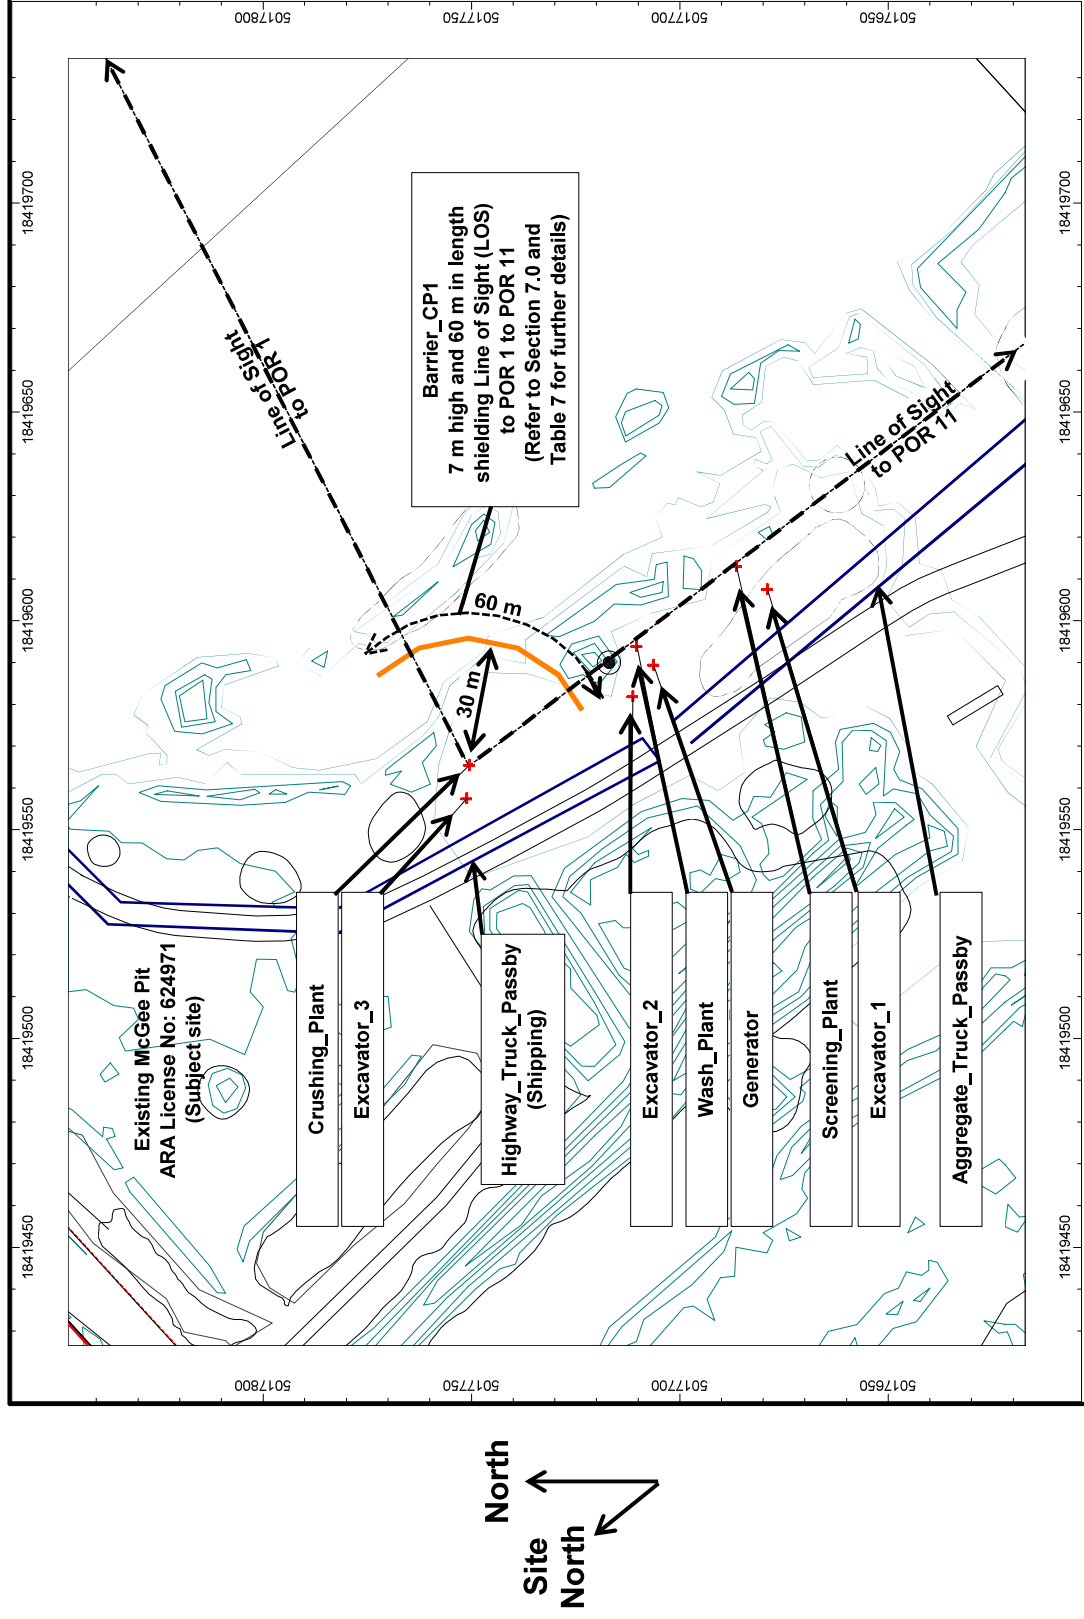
Detailed Plan at Mobile Crushing Plant showing location of Barrier CP1
